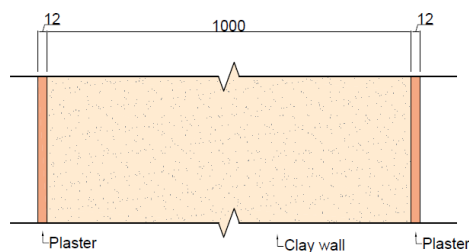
M6 external wall cross-sectional detail. All dimensions are in millimetres.
